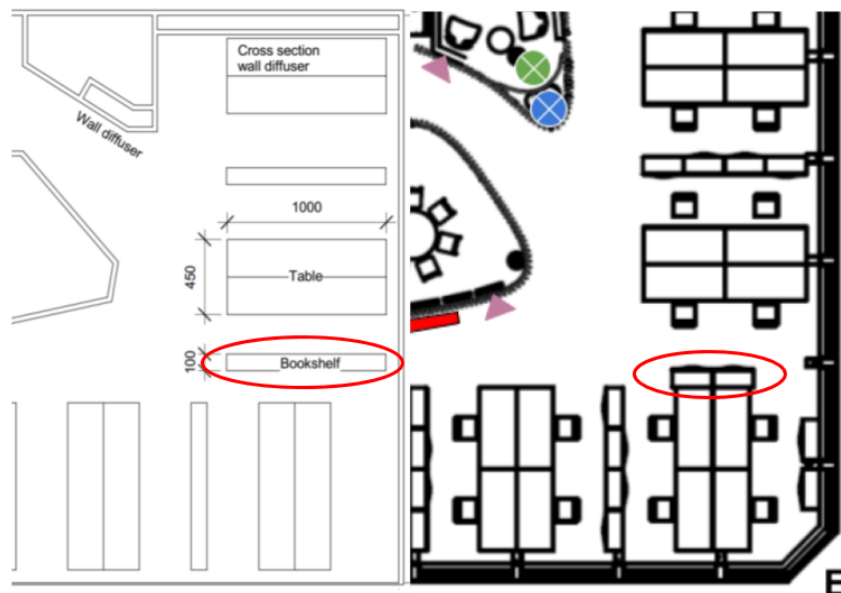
East corner bookshelf in model floor plan, as built (left picture) and architectural drawings (right picture).
